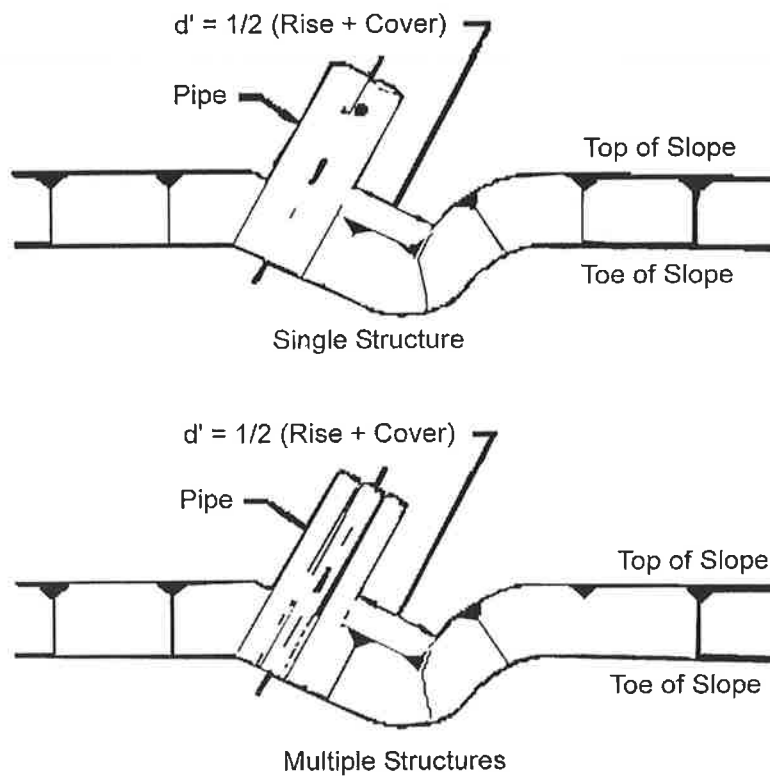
End Treatment of Skewed Flexible Culvert
